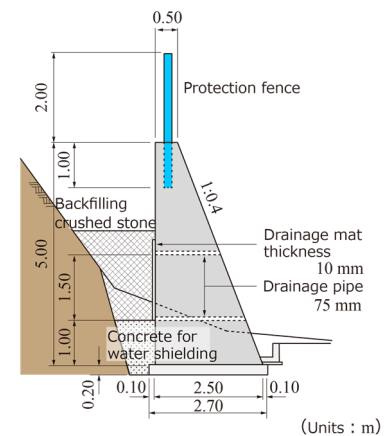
Rockfall protection retaining wall with embedded steel post for fence
